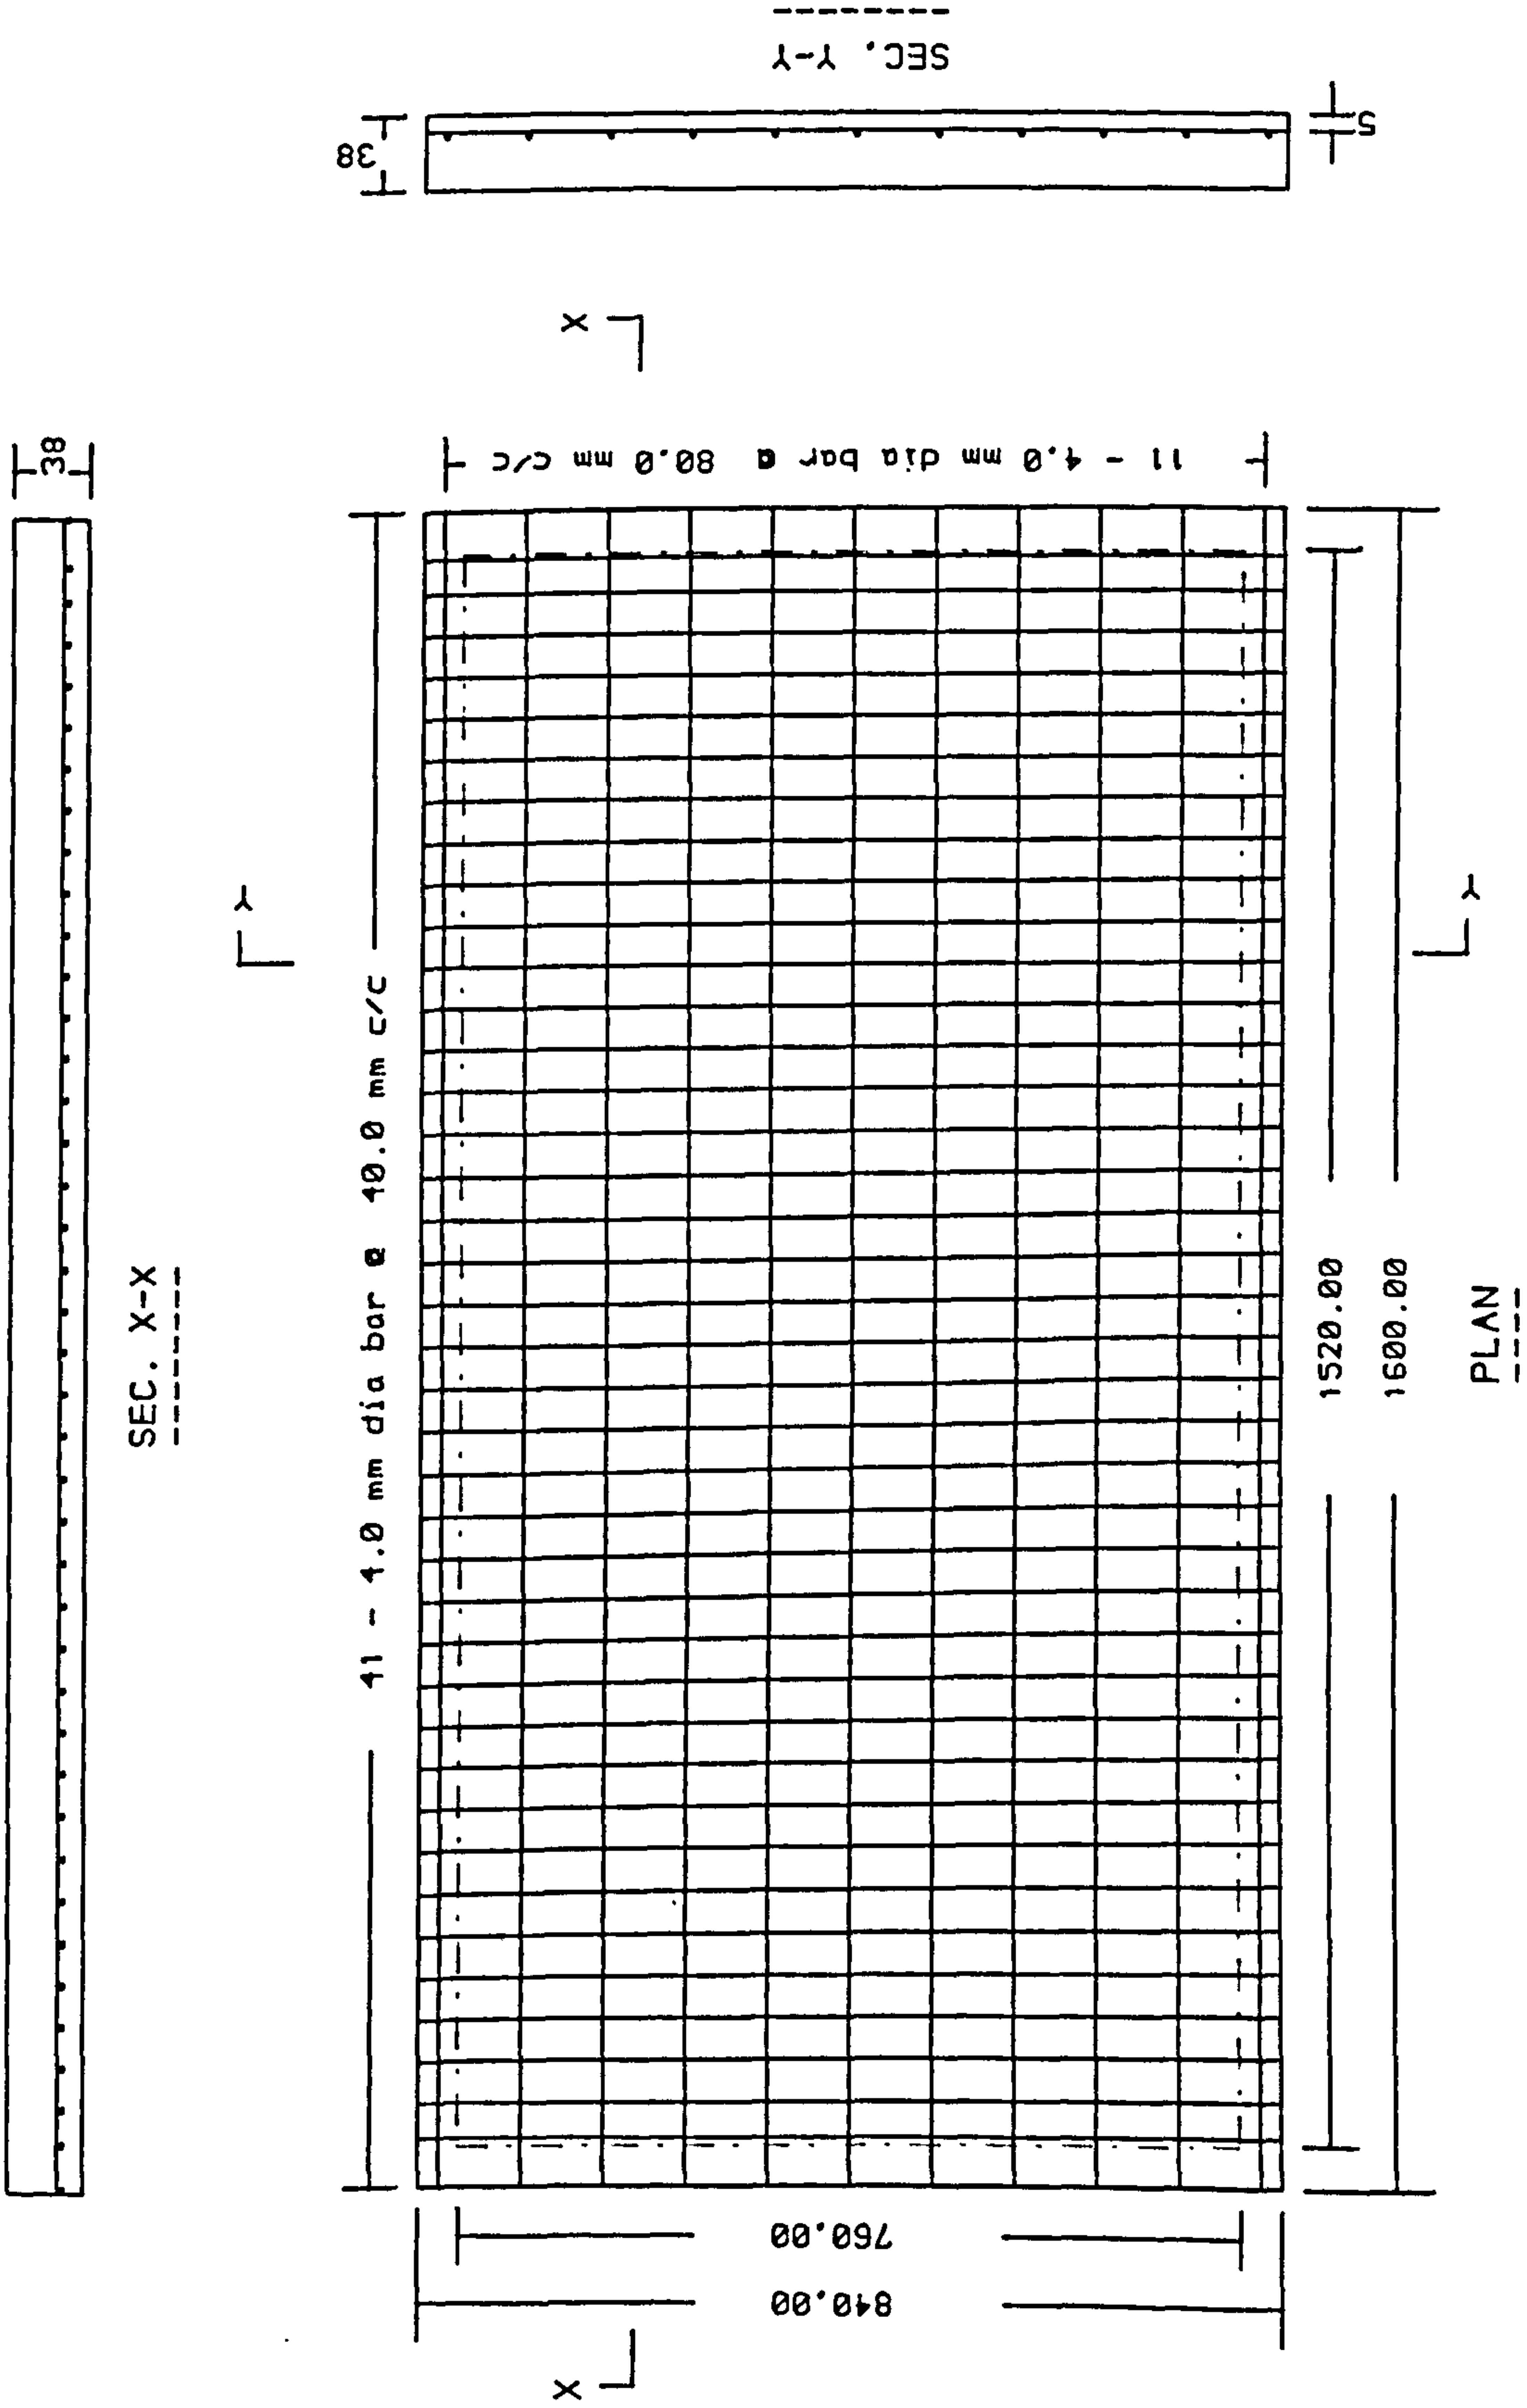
REINFORCEMENT LAYOUT FOR SLAB SS:4UD
